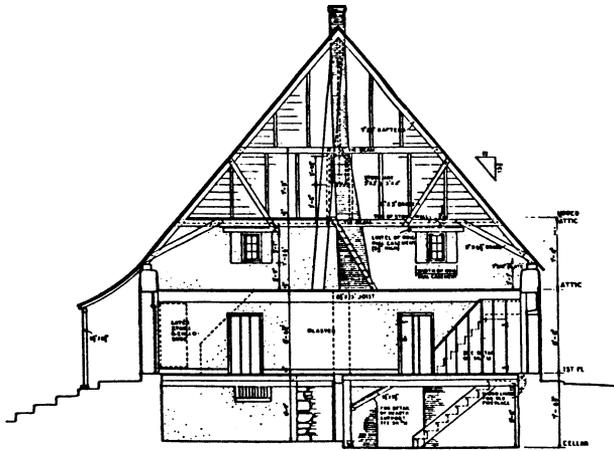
Dutch American house, with roof truss. Jean Hasbrouck house, New Paltz, N.Y., ca. 1712. (Historic American Buildings Survey, NY.)
